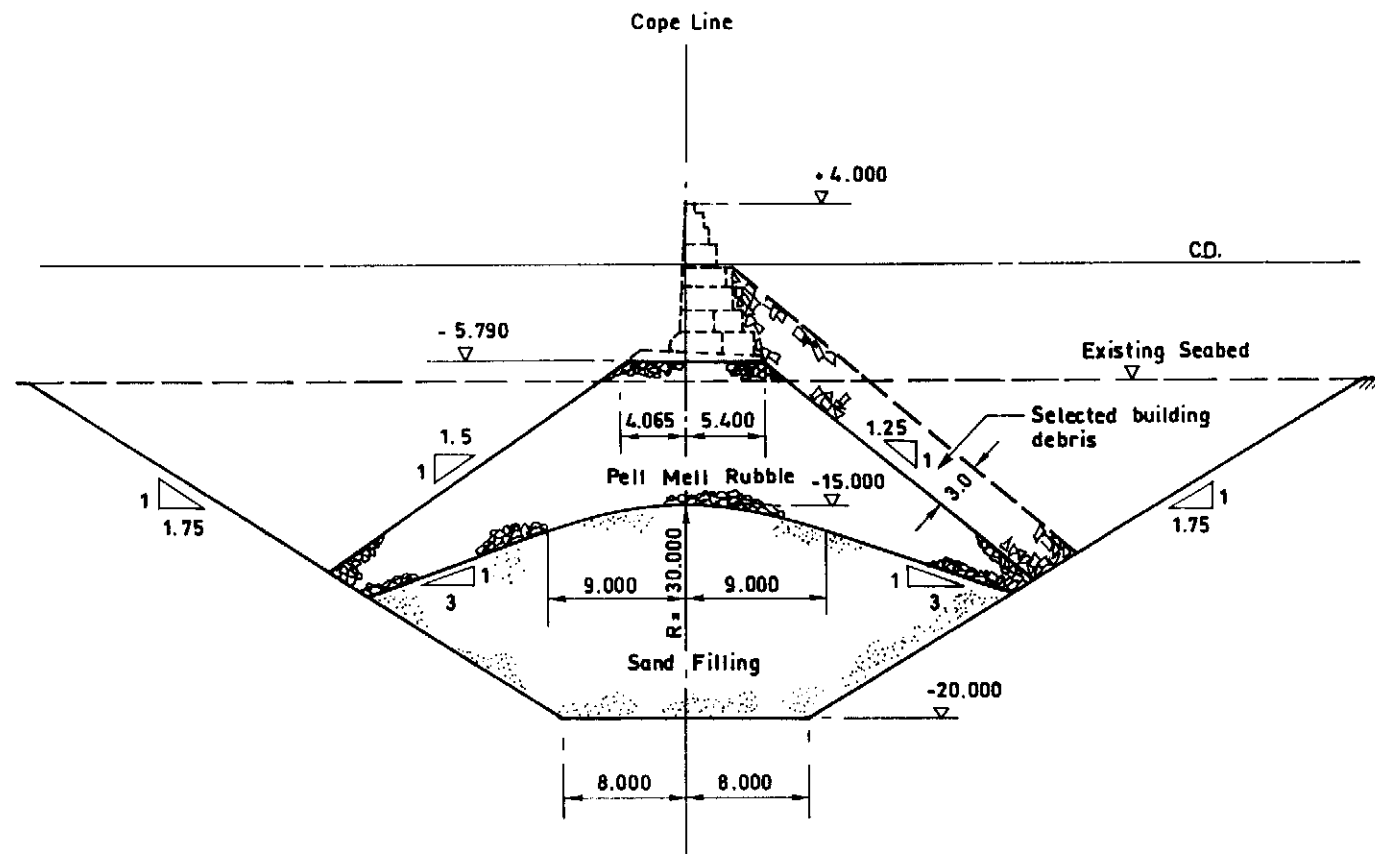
Typical Seawall Sections (Sheet 2 of 3)
